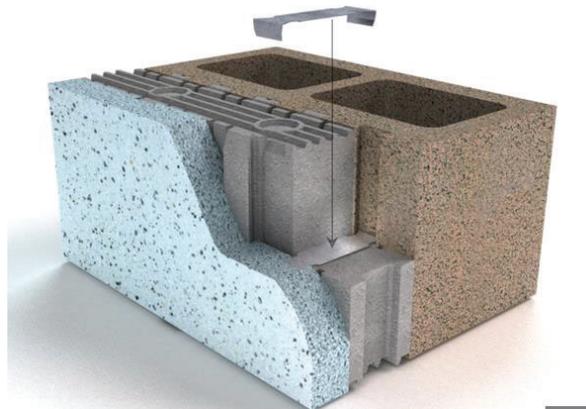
InsulTech masonry unit (Echelon, n.d.)
